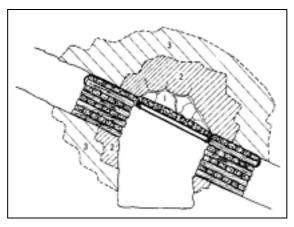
A section through a gully indicating the three main stages of deterioration. Decking to keep the hanging in place not only provides safety but inhibits the second and third stages of deterioration in the hanging and footwall (after Cook et al, 1972).
